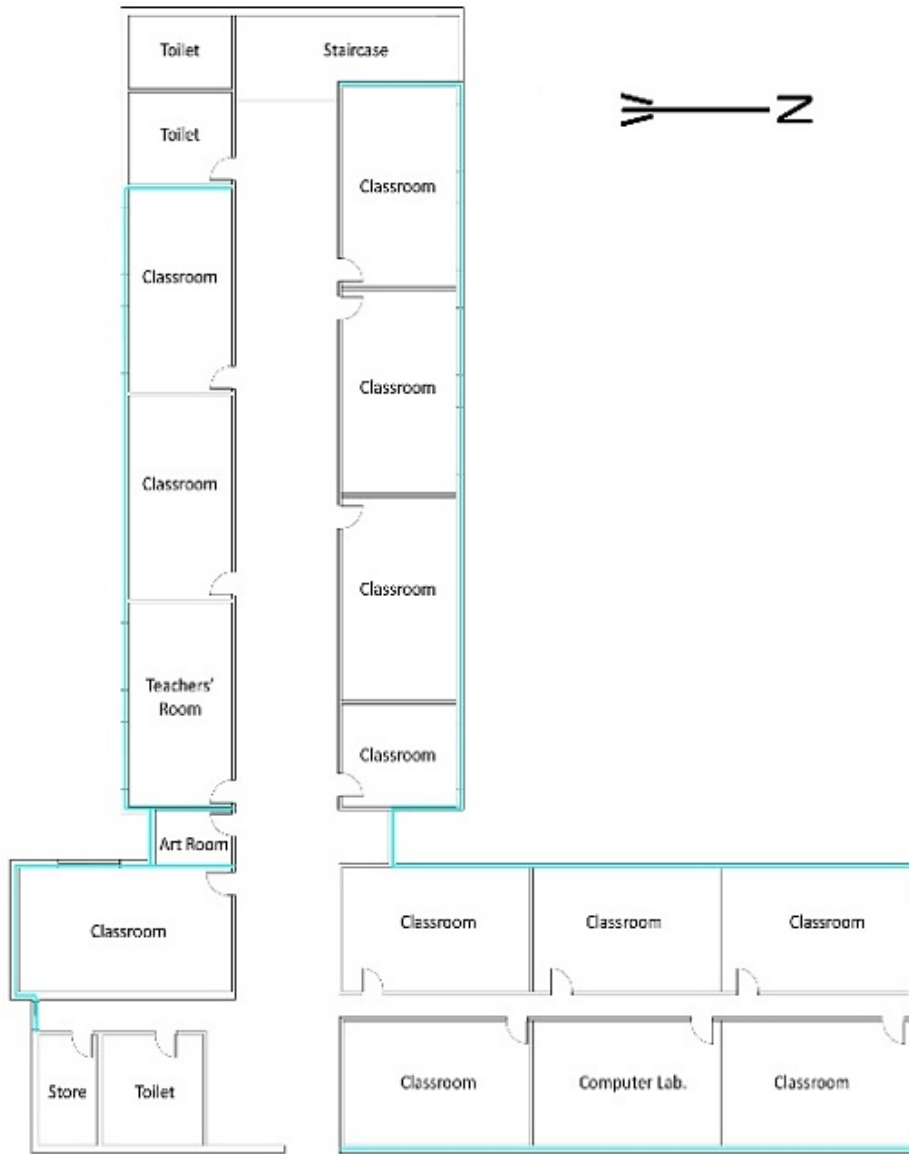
First floor plan of the school (N.T.S.). Blue (thick) lines indicate walls to host 5cm XPS insulation, CMU, and finish layers
